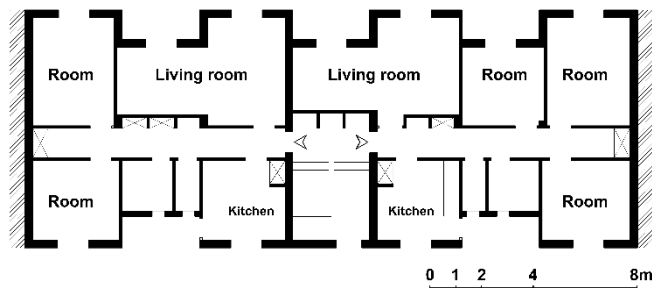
Planned building with two apartments per floor in Cité El Haouas, Djelfa. (Source: Authors, 2024)
